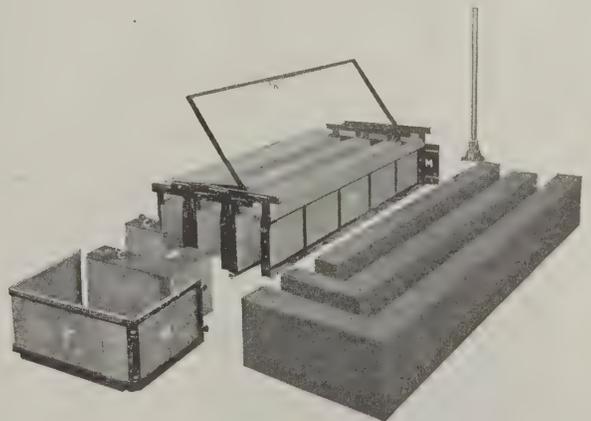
The Van Guilder 3-Wall Concrete Machine with Specimen of Its Work
